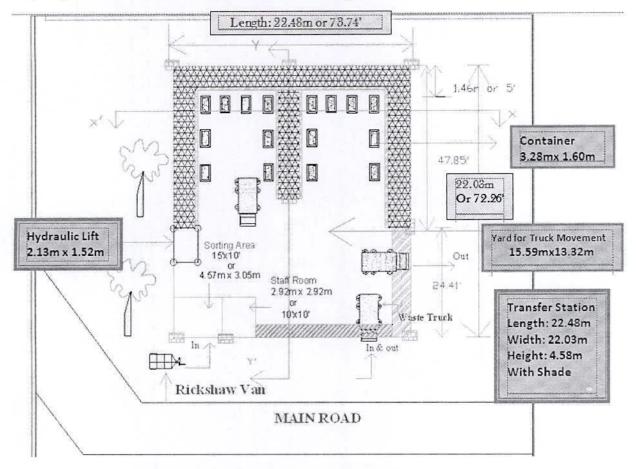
Design of Transfer Station with Hydraulic Lift
